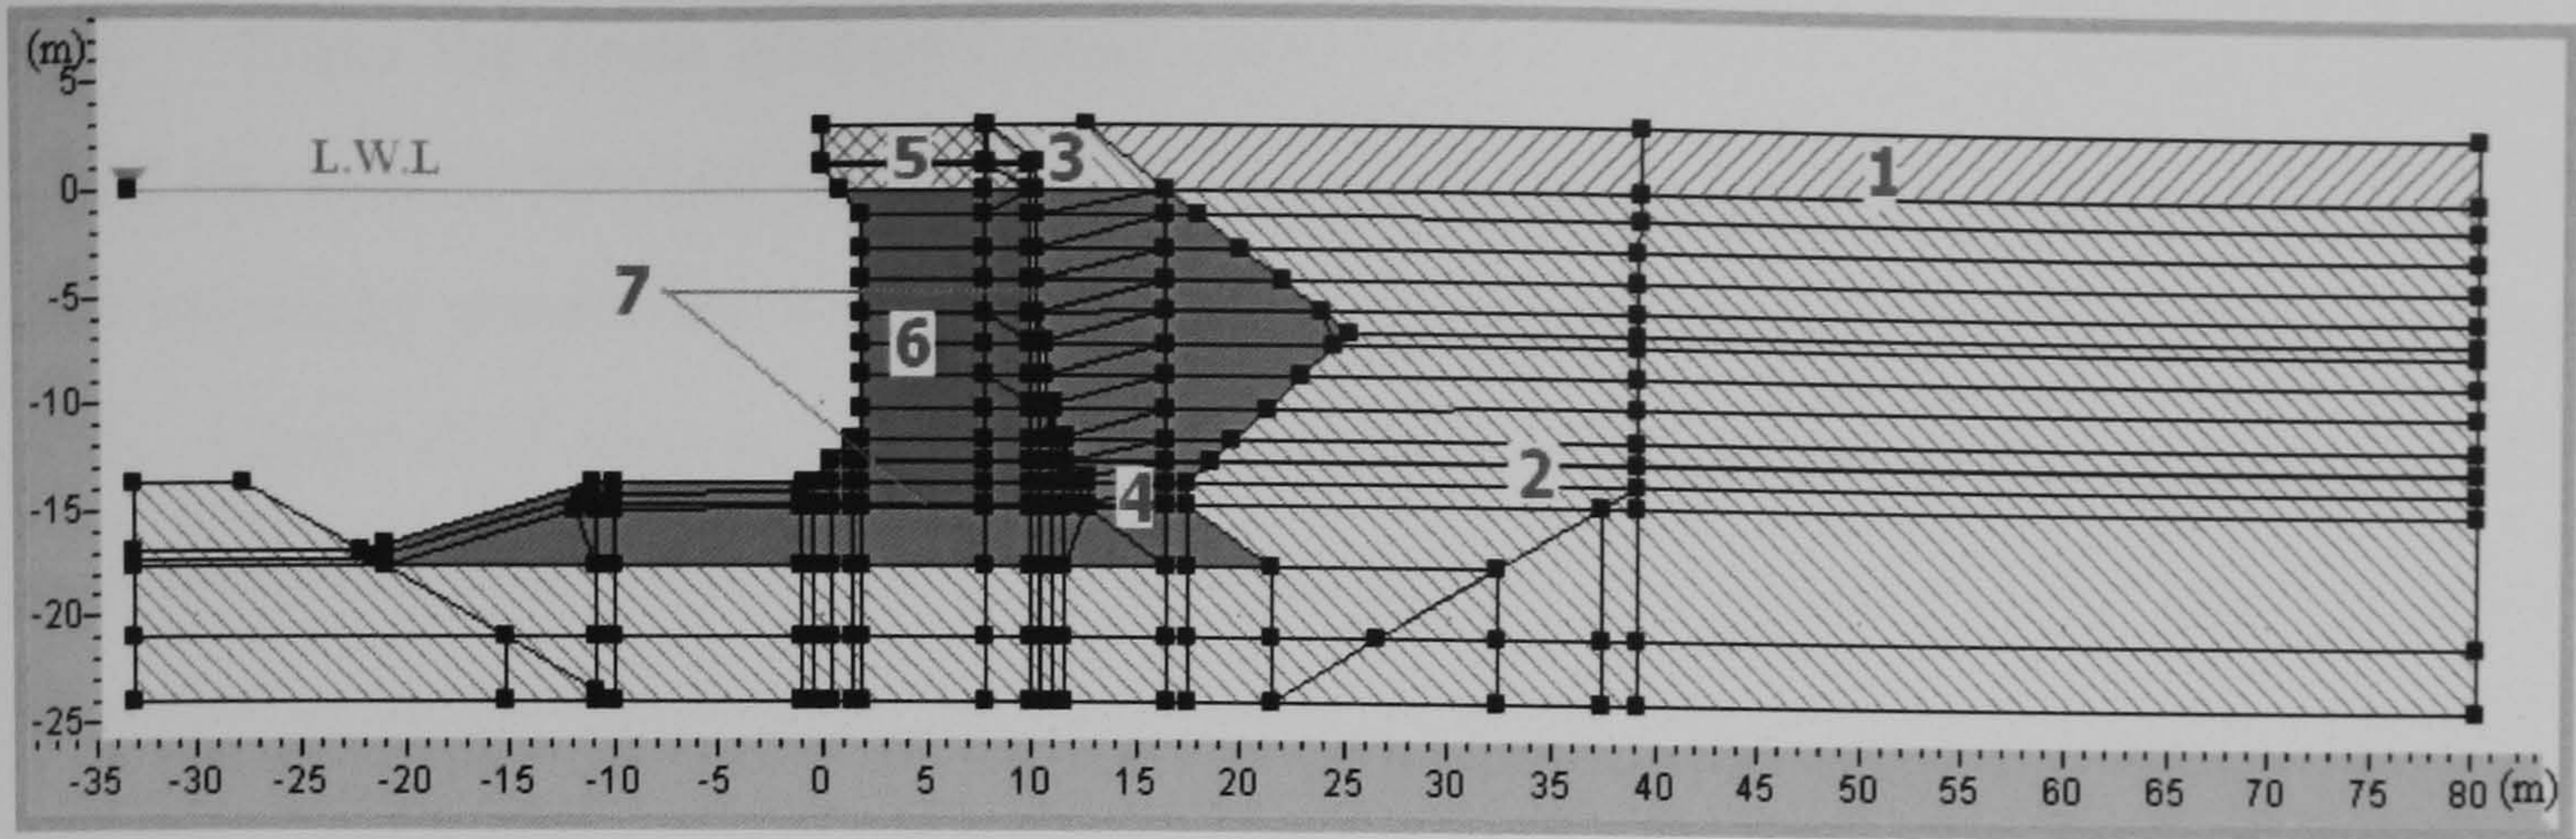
Geometry (in natural scale) and material zones of the Jeddah Port Berth 4 quay wall; zone 1 is saturated backfill soil, zone 2 is submerged backfill and foundation soil, zones 3 saturated backfill rubble, zones 4 submerged backfill and foundation rubble, zone 5 is the dry wall, zone 6 is the submerged wall and zone 7 is the interface
